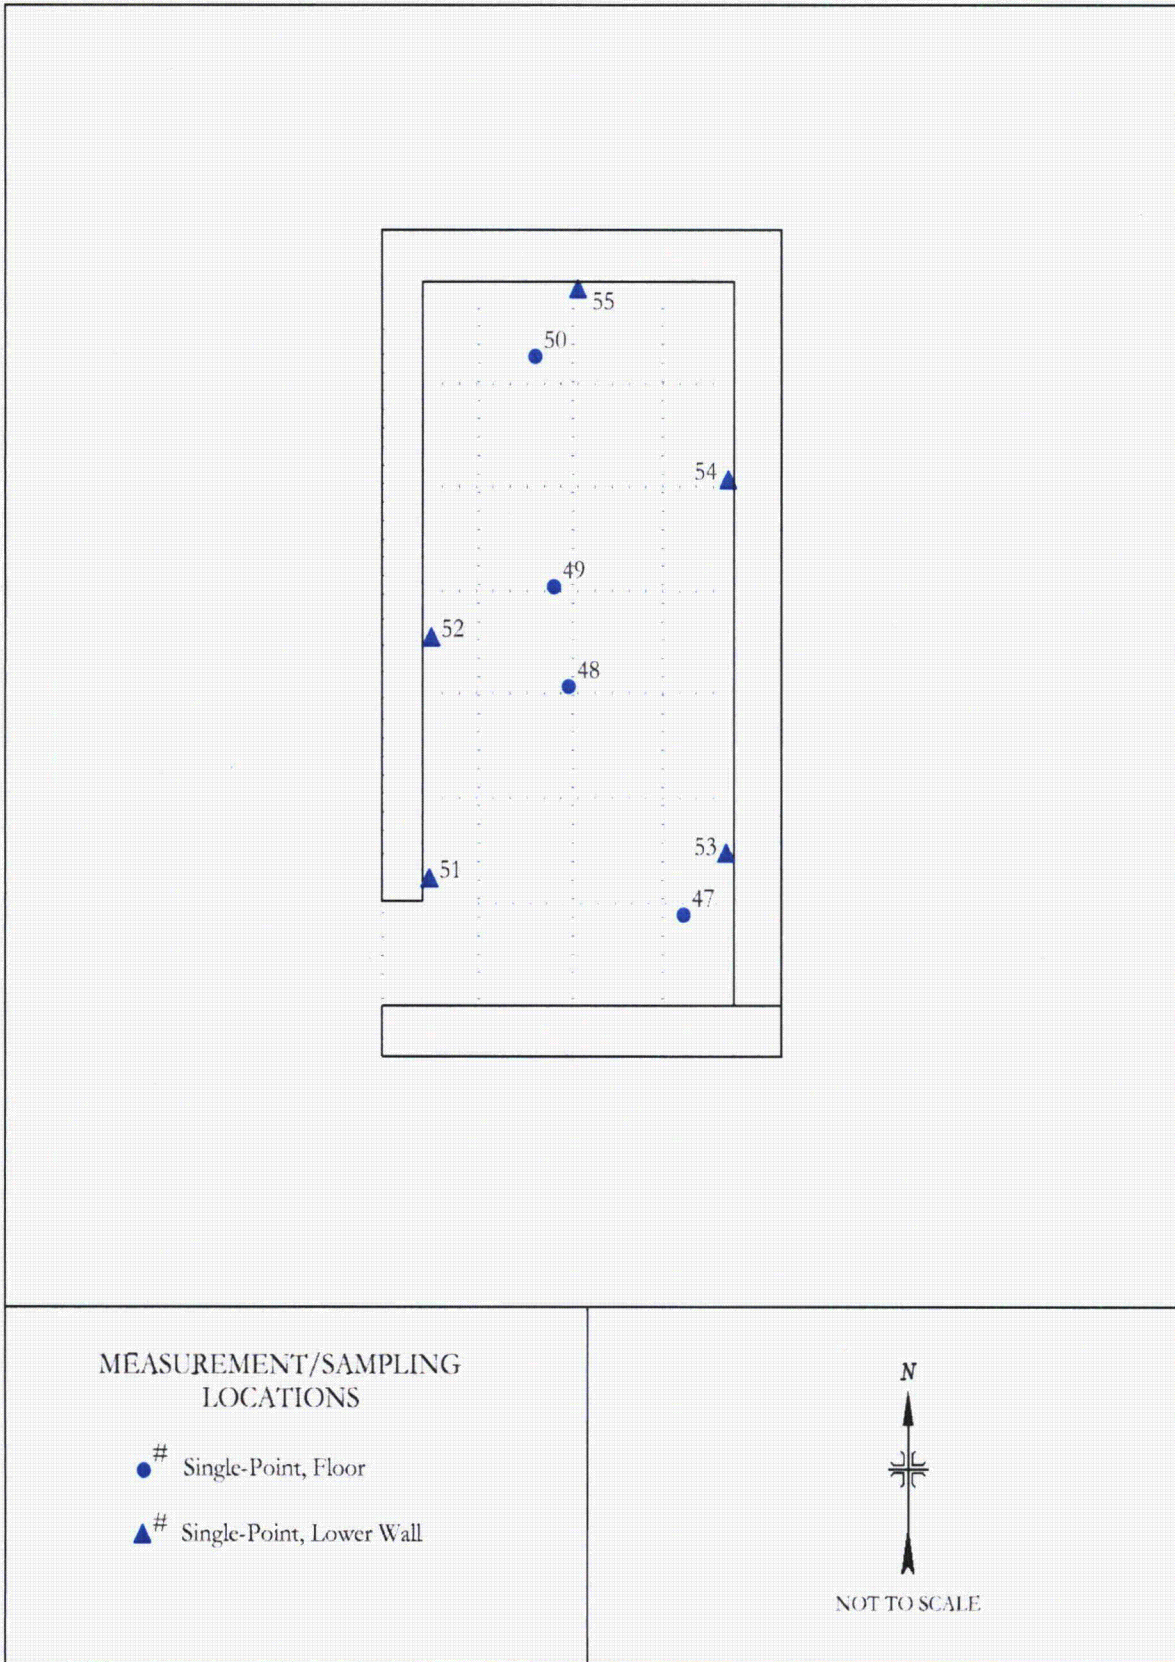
Auxiliary Building, Room 24 - Direct Measurement Locations
